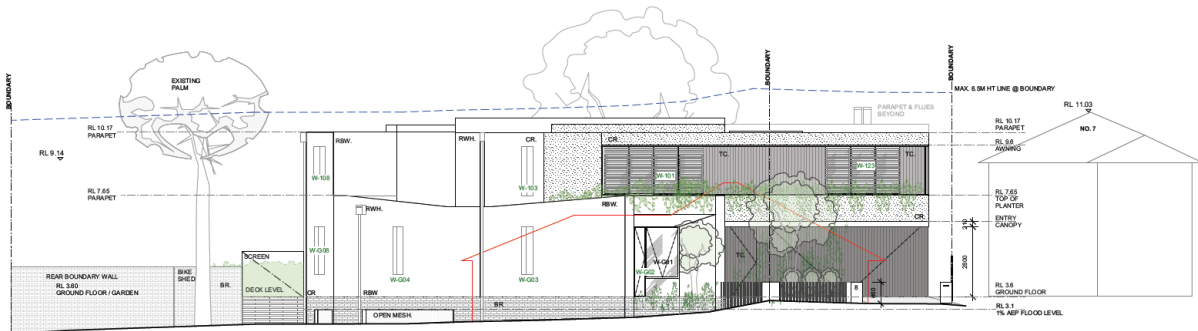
Proposed east elevation. The footprint of the existing dwelling is outlined in red.
